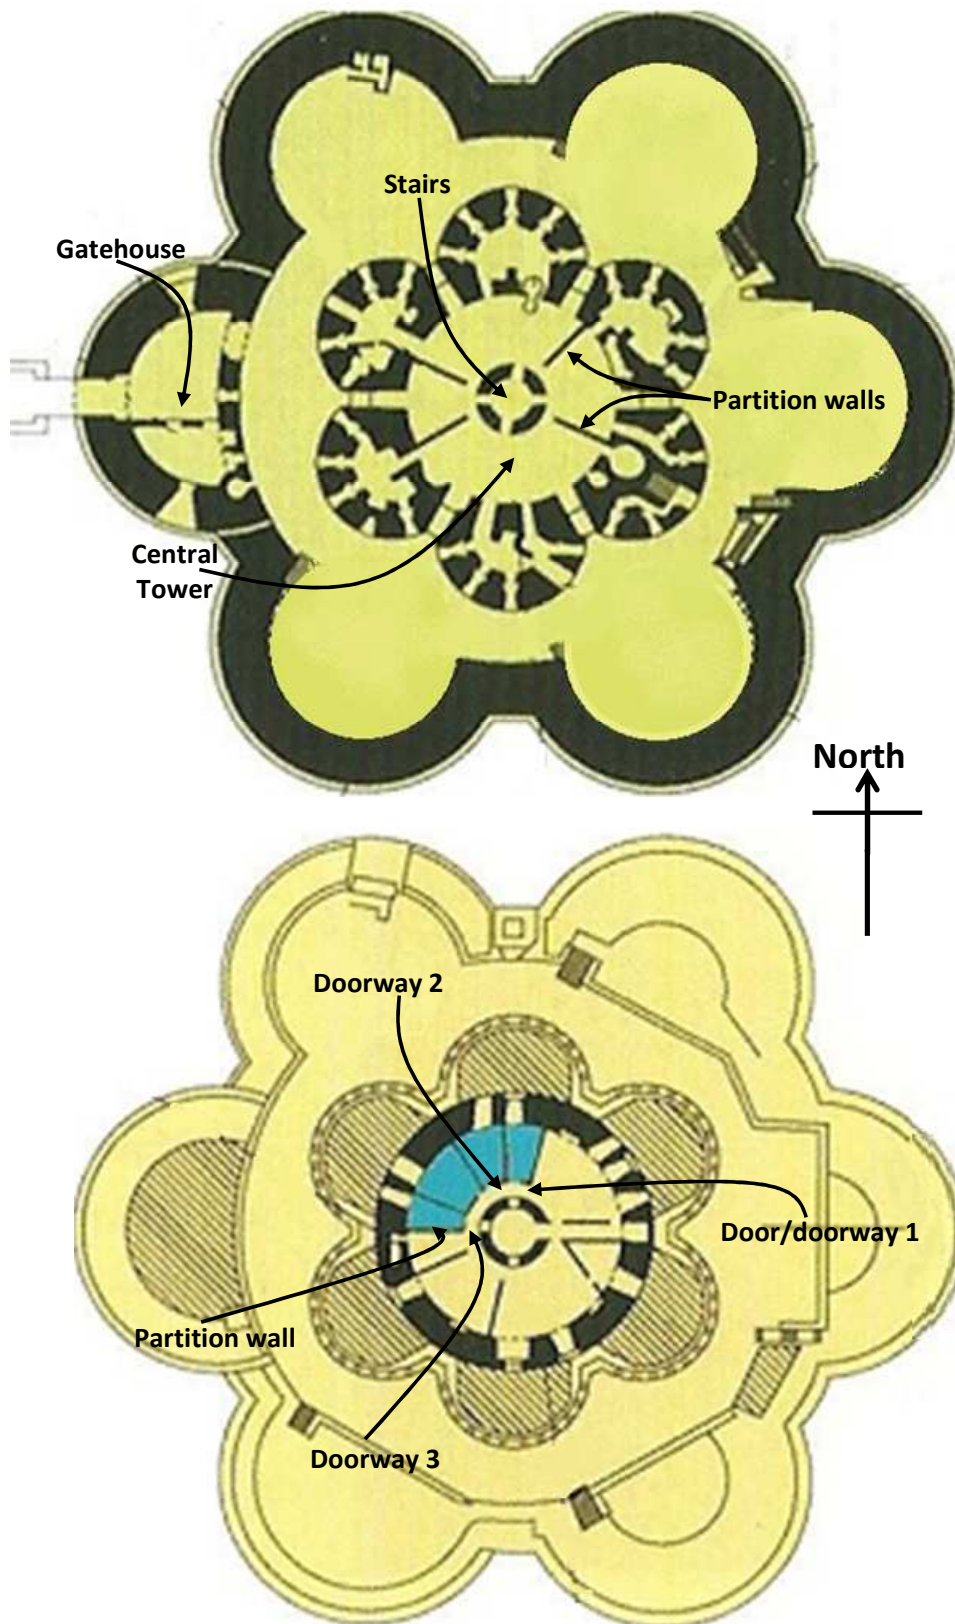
b: Ground/first-floor plans (top/bottom) of Deal Castle to show sampled areas (after English Heritage Guidebook: Deal Castle)
